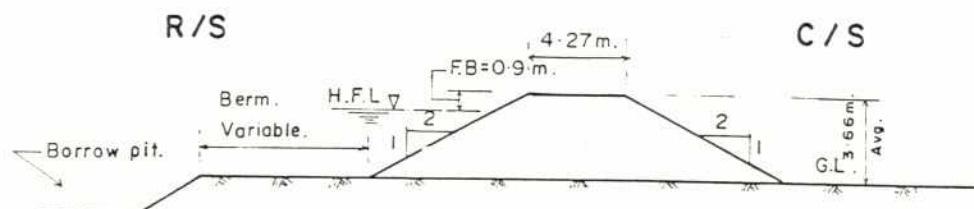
TYPICAL EMBANKMENT SECTION OF KONAPARA EMBANKMENT.
